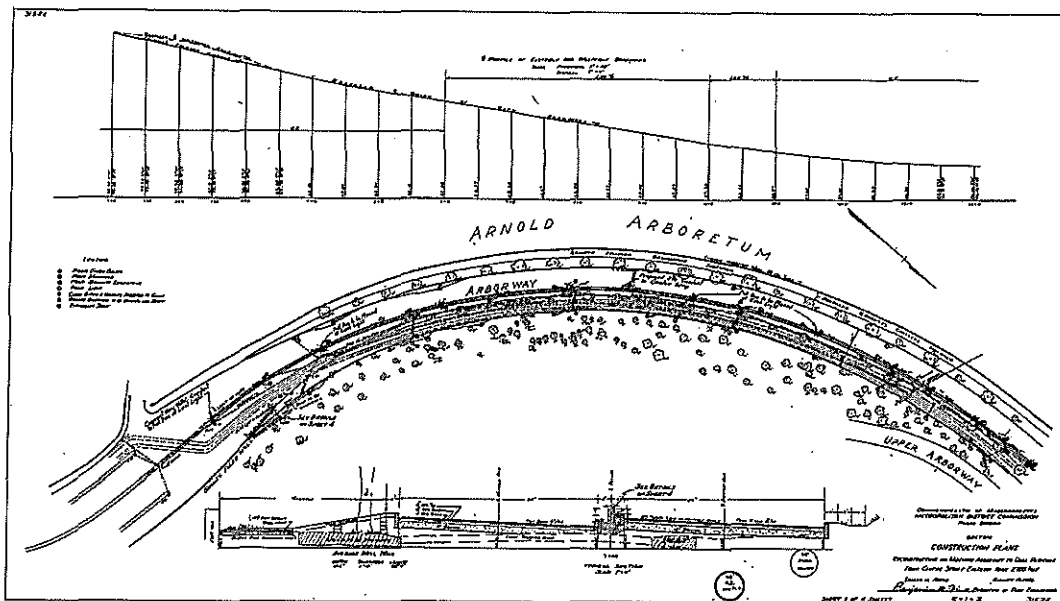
Plan Titled "Construction Plans Reconstructing and Widening Arborway to Dual Parkway from Centre Street Easterly about 2700 Feet" Sheet 1 of 4, by Benjamin W. Fink, August 17, 1953 (MDC # 31526).
